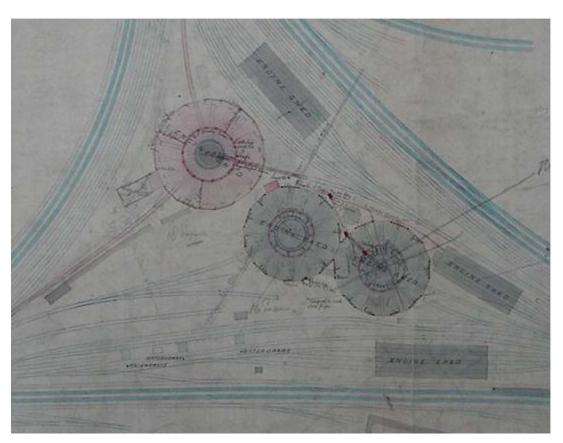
NER proposals plan for RH3 (built c. 1863), with overview of the YET site (NA RAIL 527.2369)
